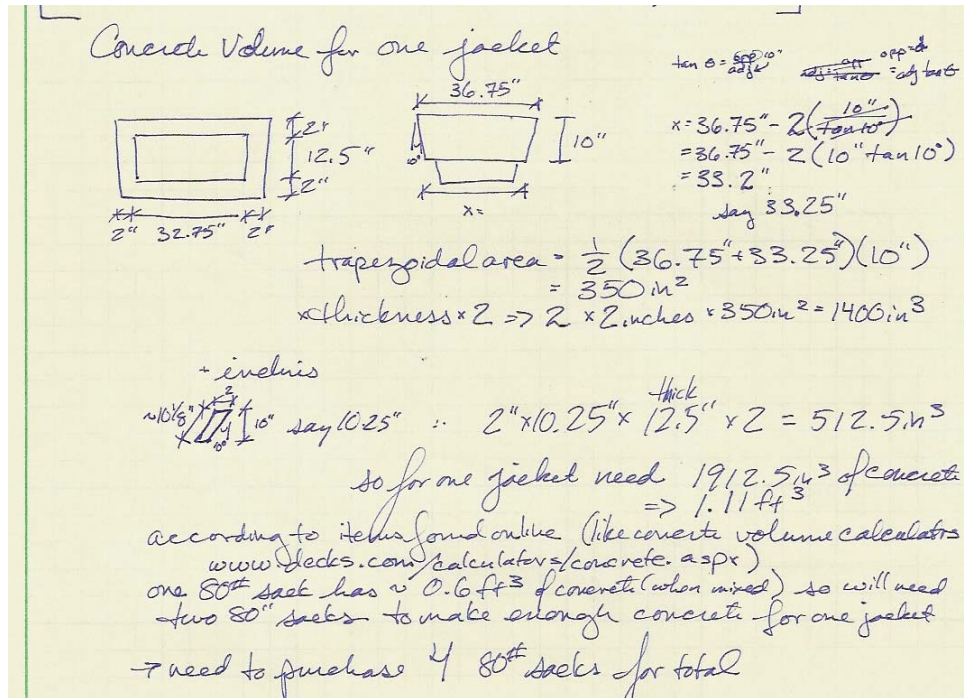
Concrete Volume Calculation for Concrete Jacket Repair
